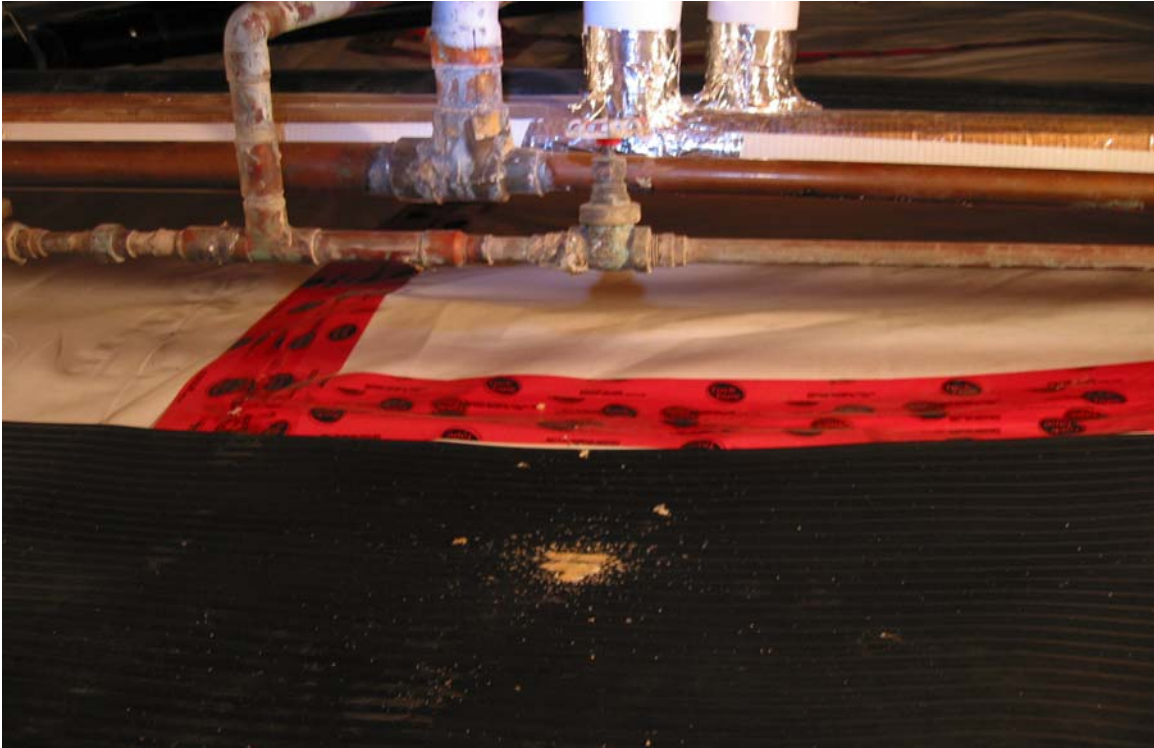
Water and sewer lines are suspended off the crawl space floor. The rubber mats and white floor barrier are helpful in identifying the location of leaks.
